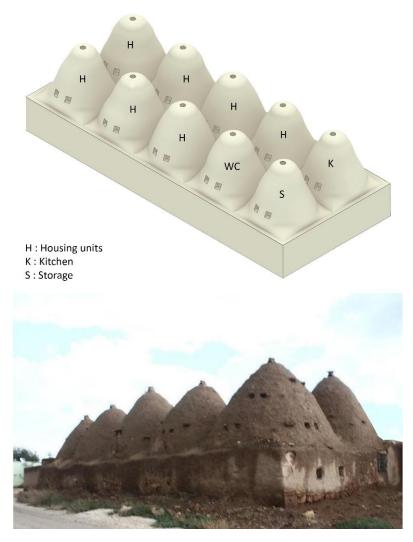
3D model and photo of a domed house with direct access to exterior (2025). (Source of photo: Gülmüş, 2023).
